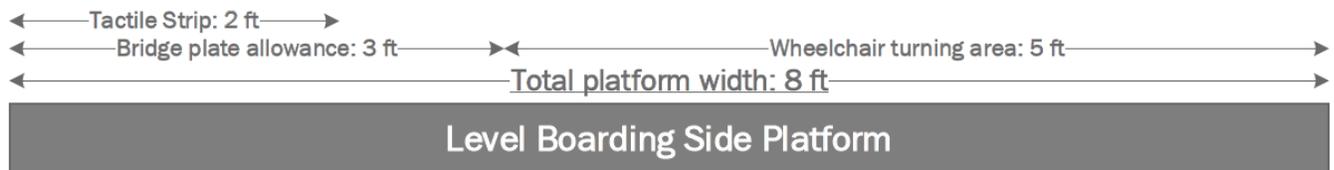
Level-Entry Boarding Side Platform Minimum Width. Source: USDOT
